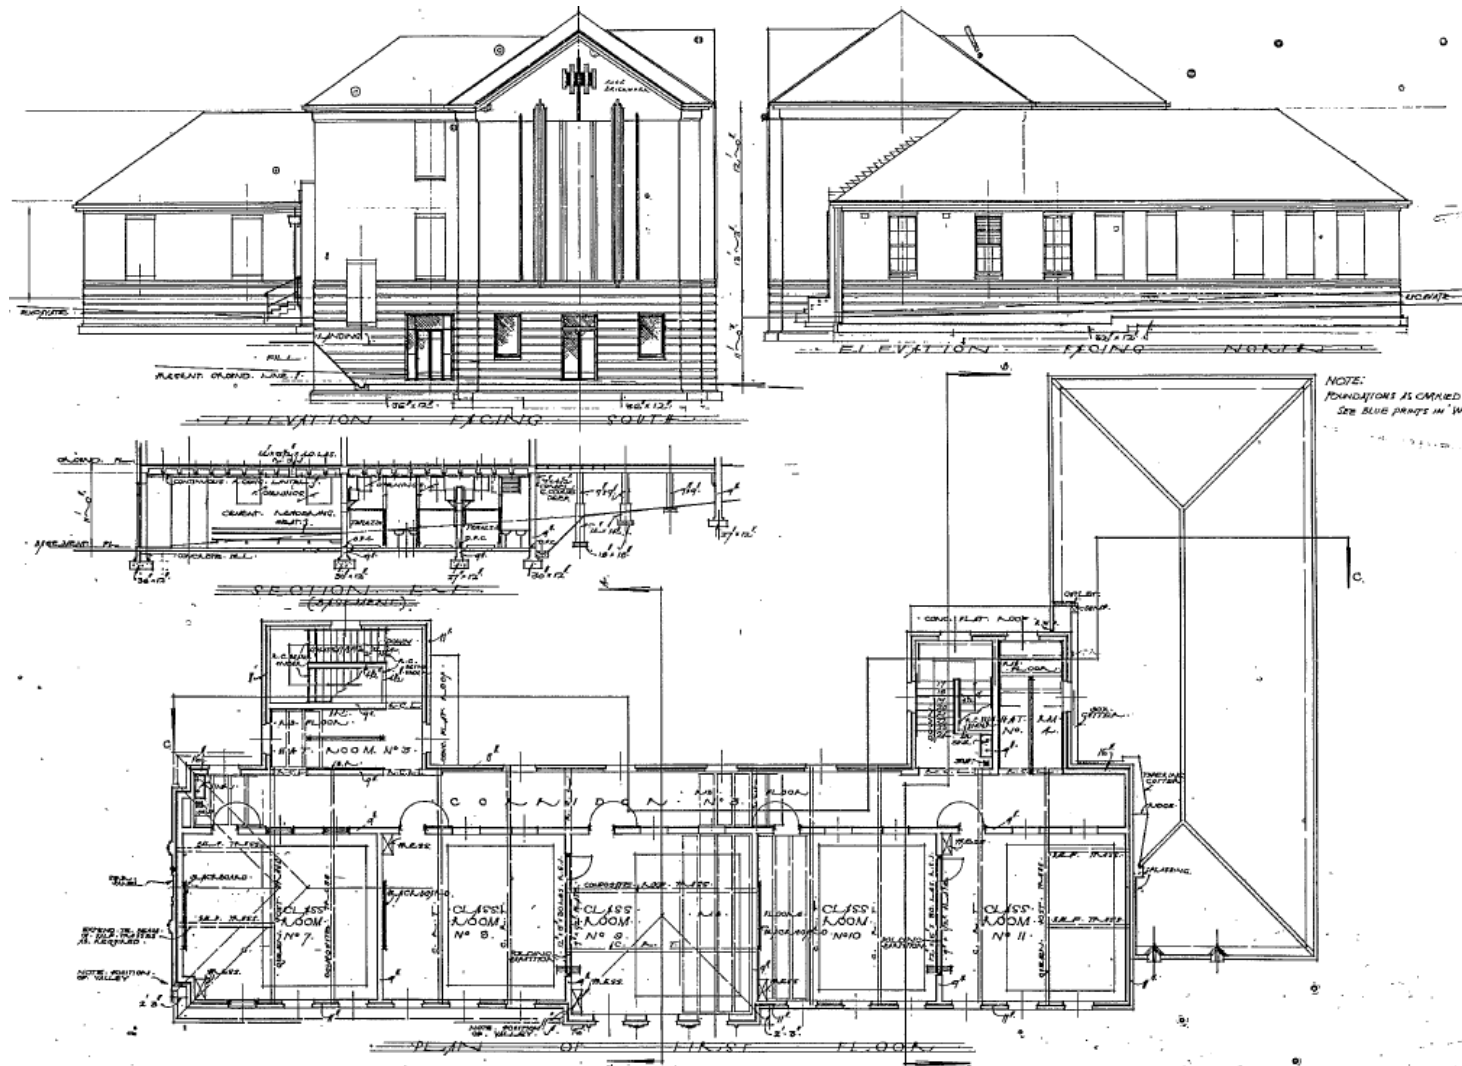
1934 South and North Elevation and First Floor Plan of the Girls building, currently known as Pacific building. Source: Government Architect plans, copy held by NSPS
